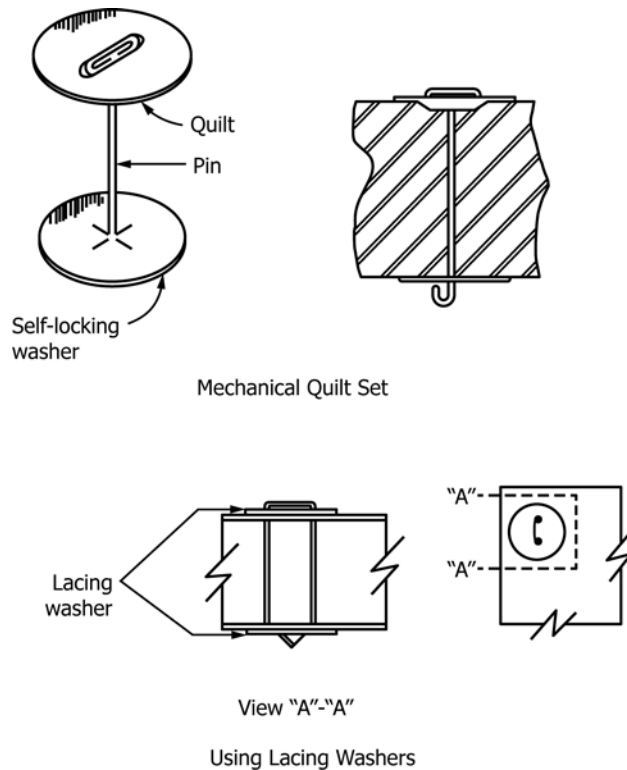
Typical Methods of Quilting Removable/Reusable Blankets
